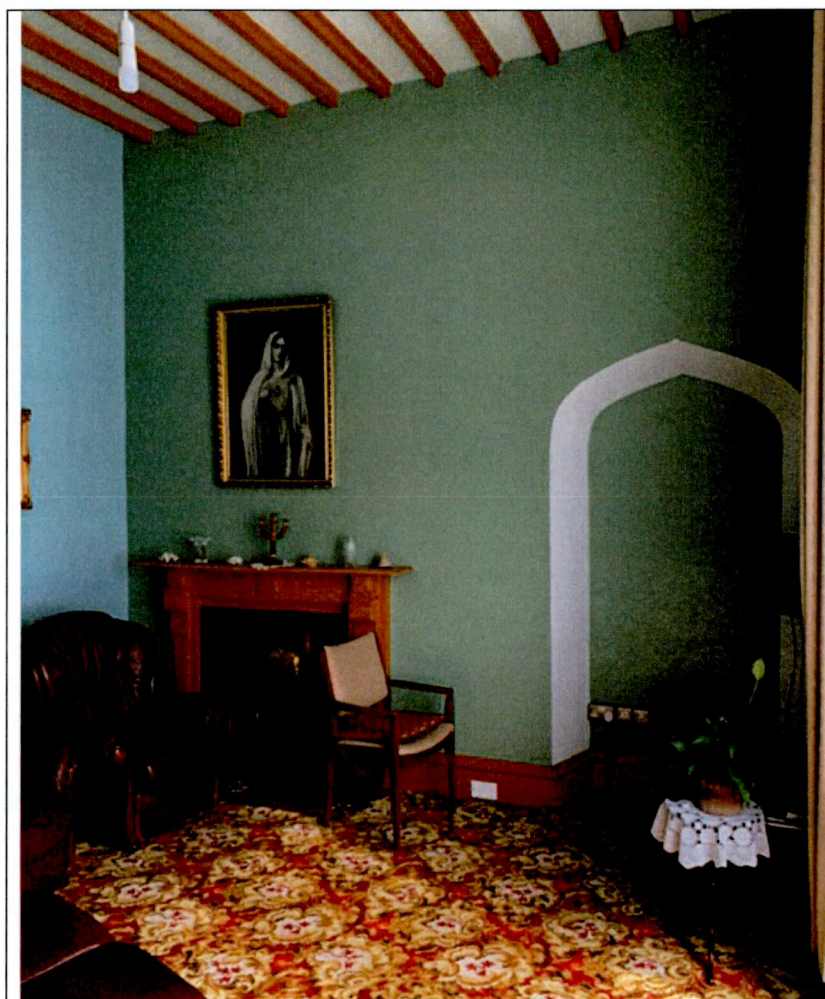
View within Room G-04 toward existing chimneypiece and alcove where new door is proposed.
